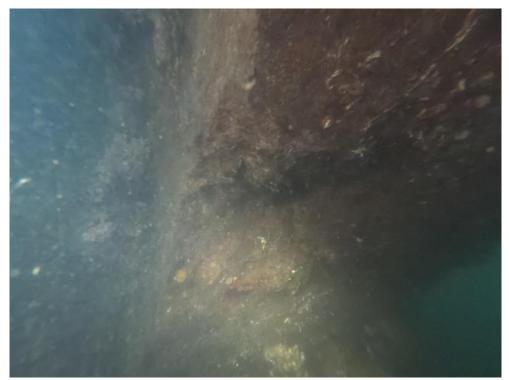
Loss of concrete to underside of VDM (Frame 20)
